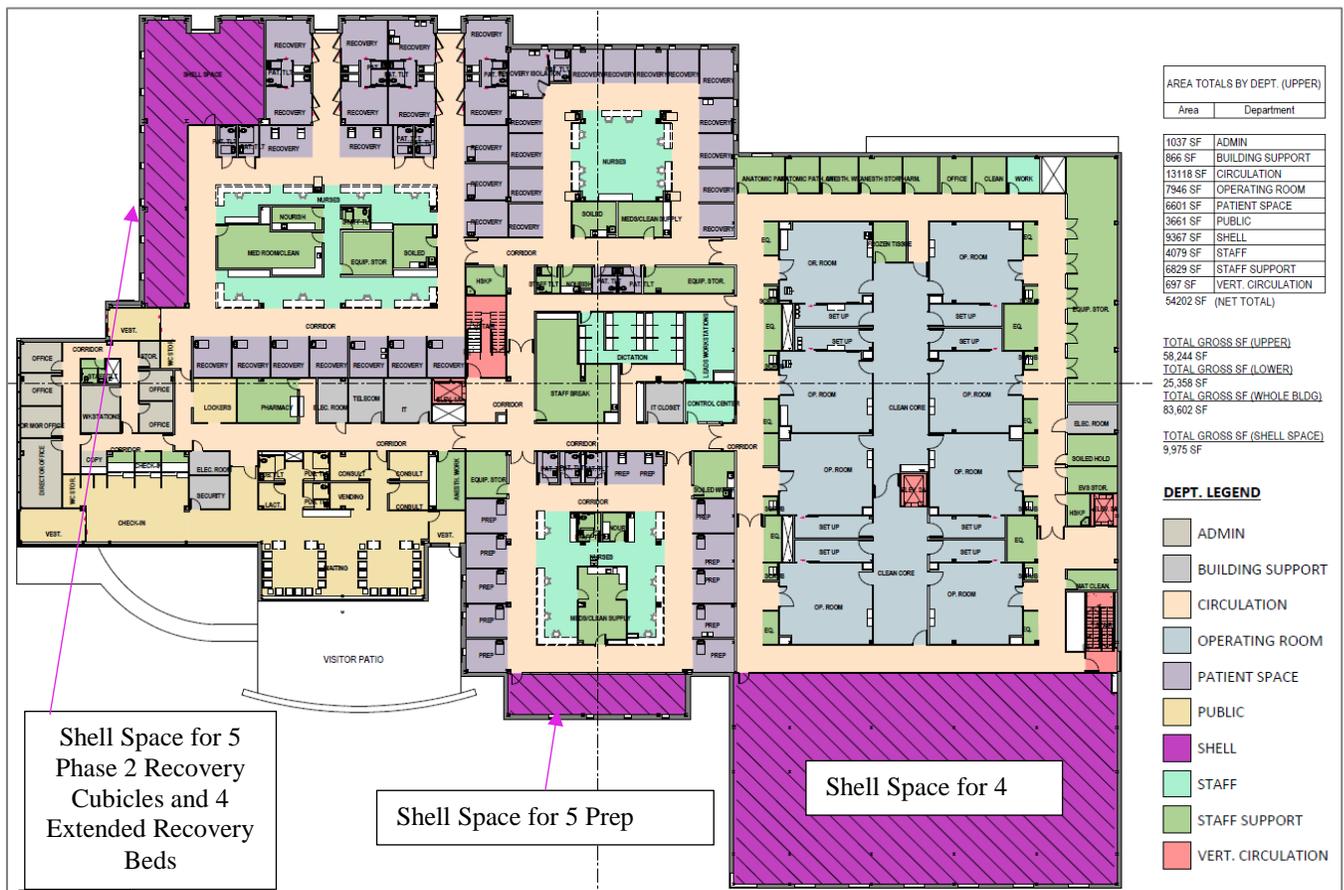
OSC Floor Plan: Ground Floor Level.
